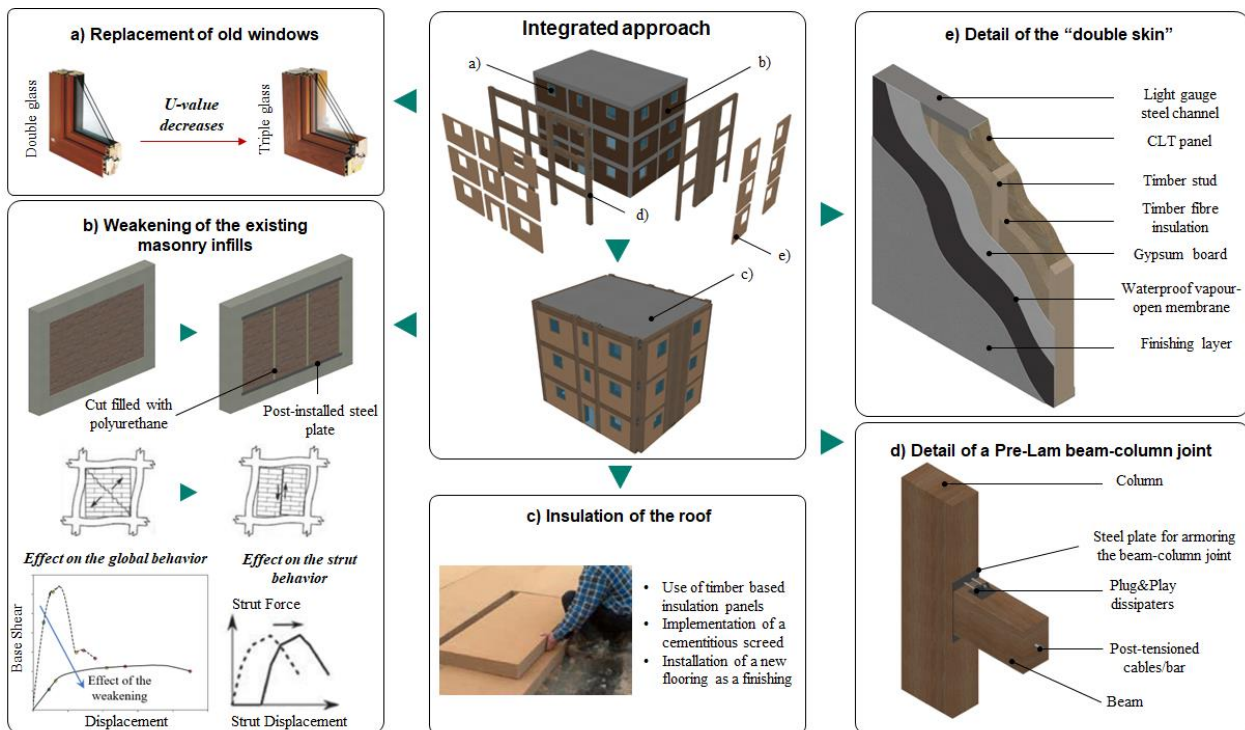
Schematic representation of the integrated intervention proposed, consisting of: a) replacing old windows, b) selective weakening of the existing masonry infills, c) roof insulation, d) use of Pres-Lam technology for the external exoskeleton, illustrated for a beam-column joint, and e) implementation of a low-damage timber based “double-skin” façade system for the insulation of the vertical building envelope.
